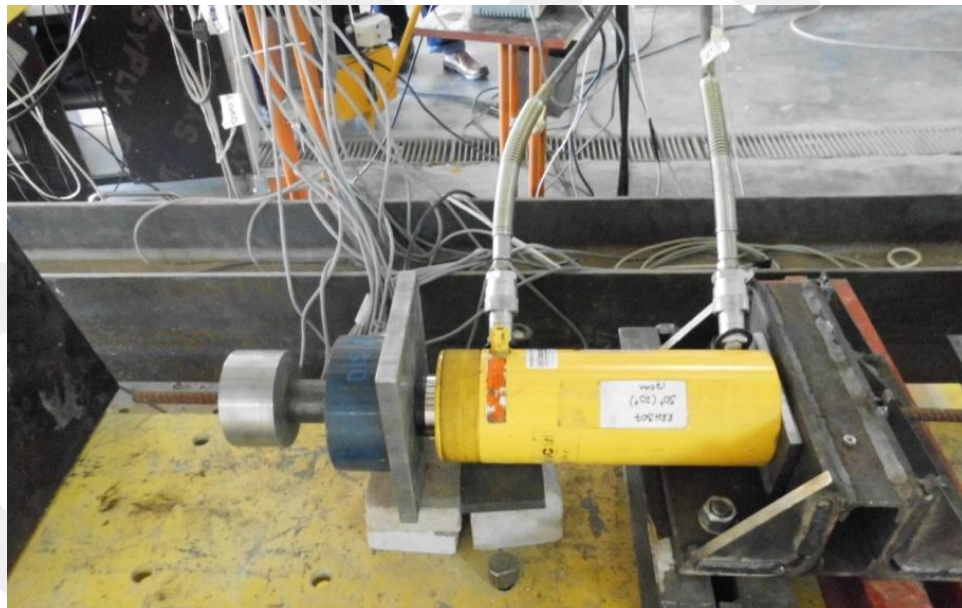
Test set-up for prismatic tension specimens with bar - end 1 (hydraulic jack, load cell, and chuck)
